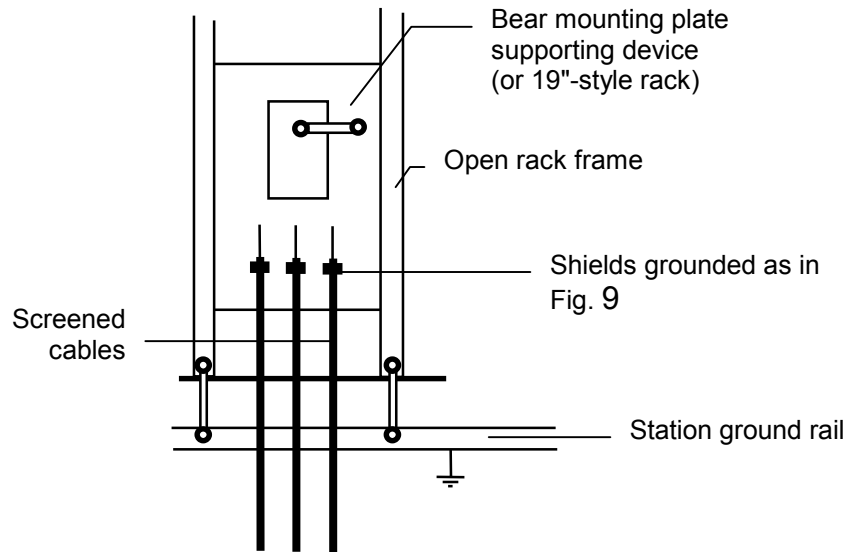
Grounding cable shields in the case of an open equipment rack (rear view)
